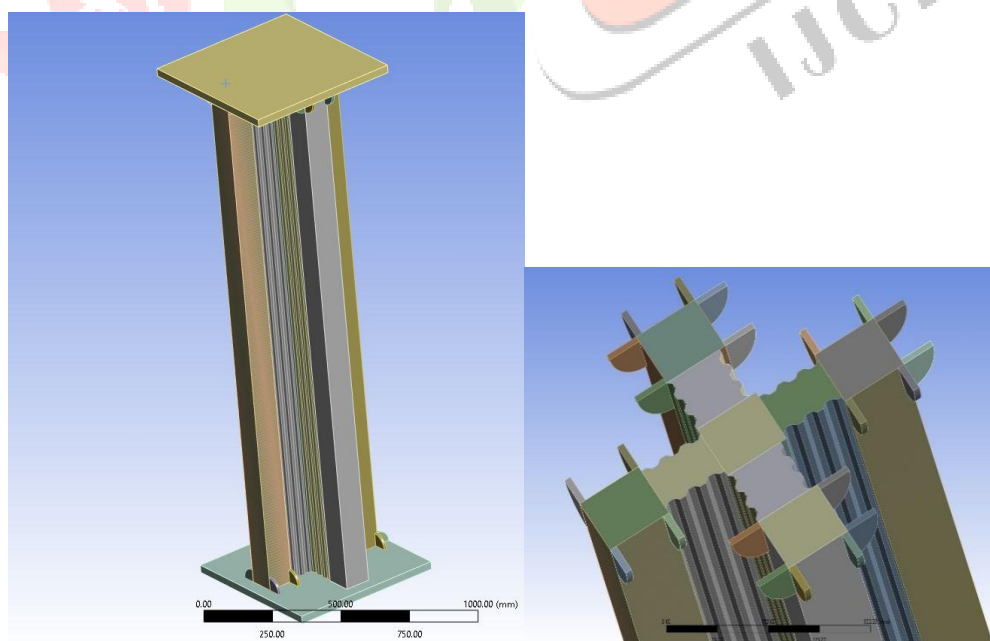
Cross-shaped CFST Column with Trapezoidal and Sinusoidal Corrugated Steel Plates
